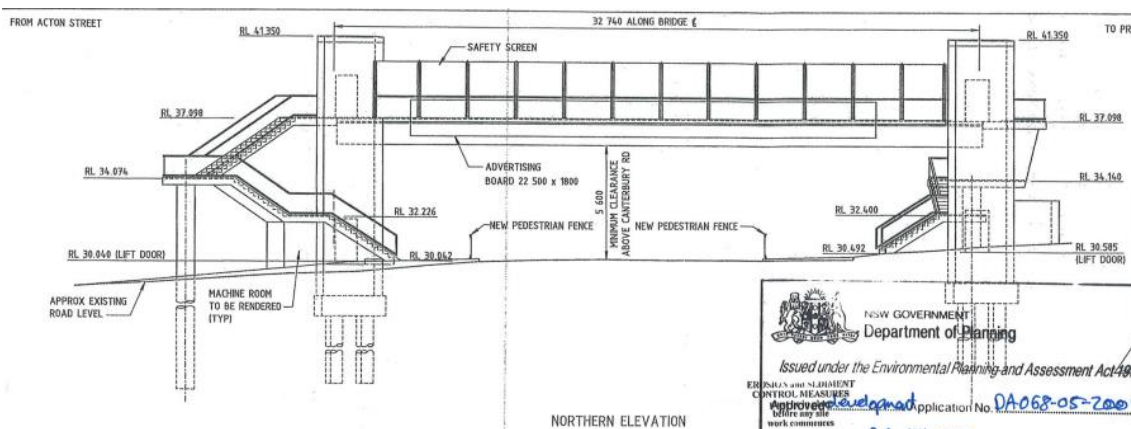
Stamped Plans – northern elevation (Source: DPHI)
